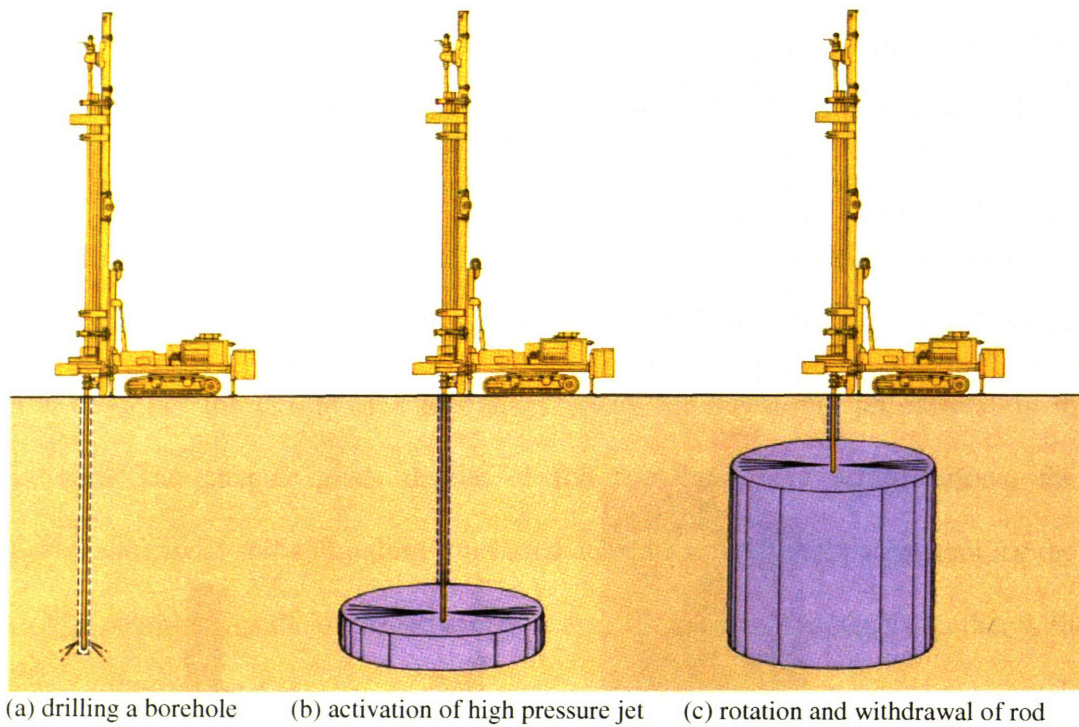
Sequence of jet grout installation (Chemical Grouting Co. brochure)
